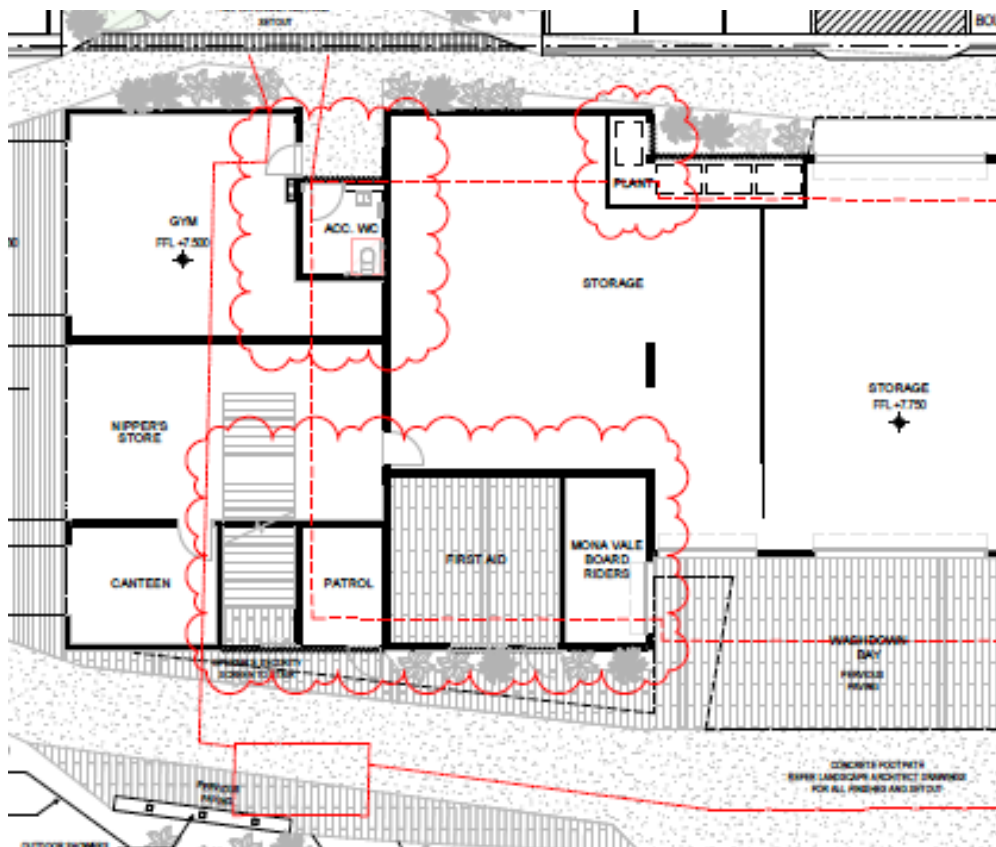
Ground Level Plan (A.DA.10.001)- Modification as Proposed.
